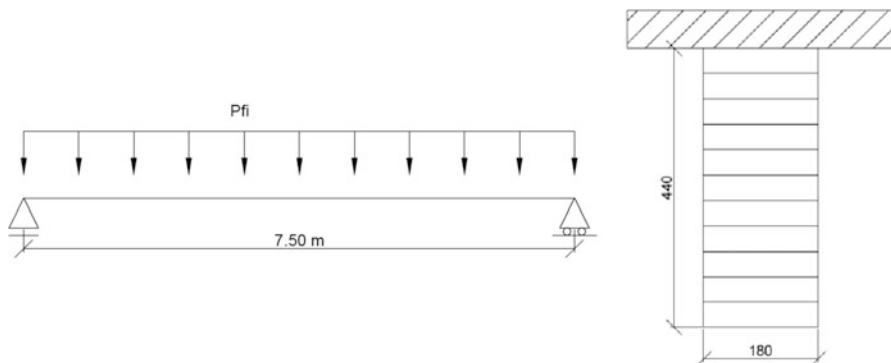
Static scheme of glulam wooden beam, with sectional details
